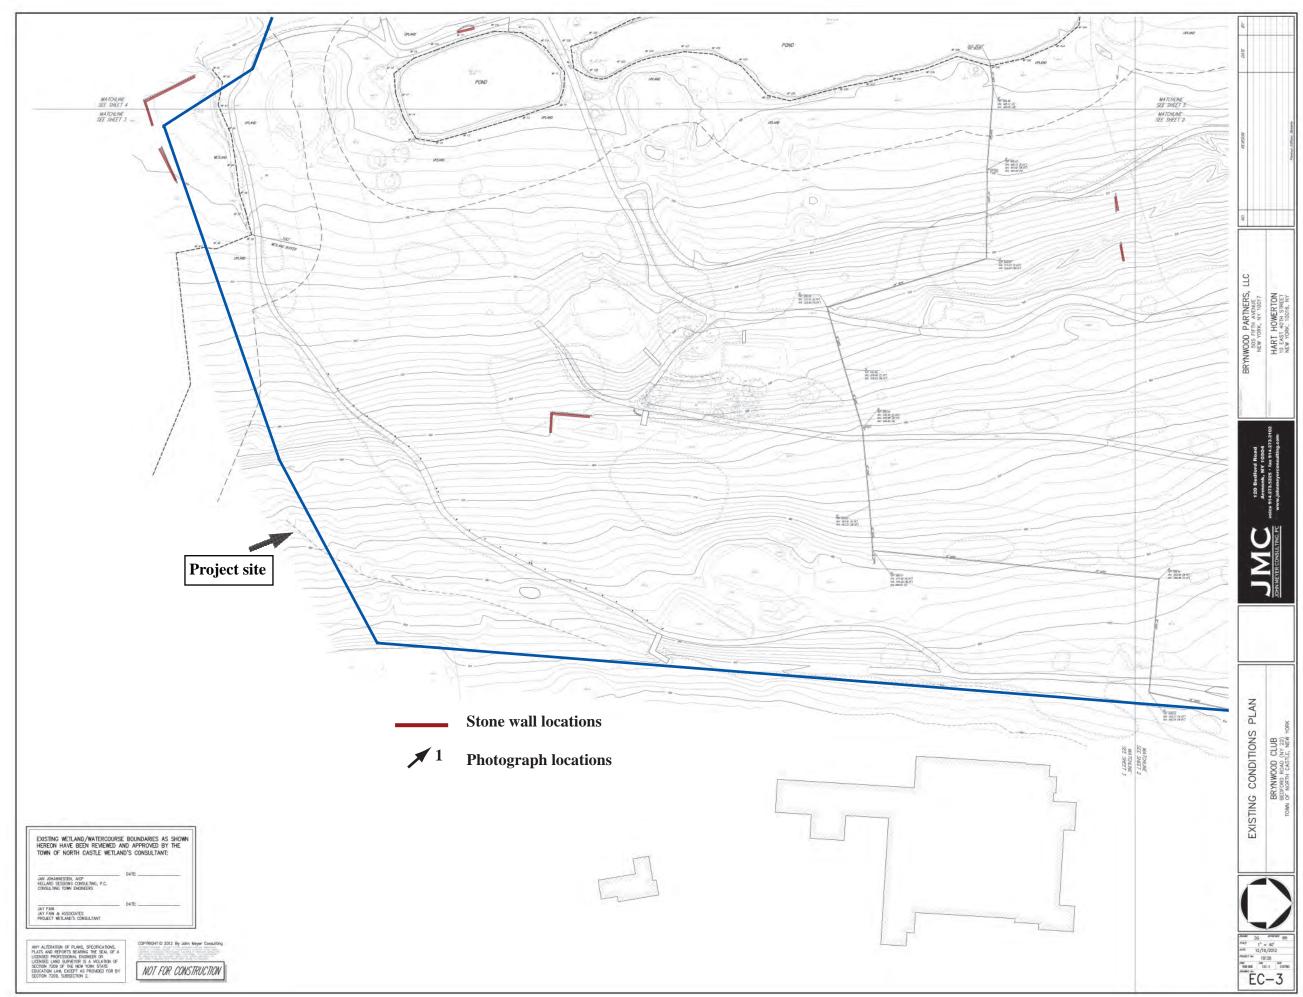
Section of project site topographical survey showing existing conditions, stone walls, and photograph locations (JMC 2012).
